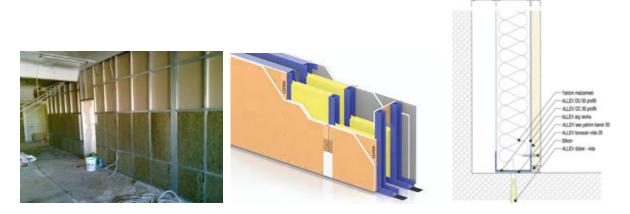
Samples of site application and 2D and 3D construction detailing models (Author 2 archive, 2021) (https://tr.pinterest.com/pin/367817494547579613/) (https://www.dalsan.com.tr/mimaridetaylar/Cizim?kategoriId=25)
